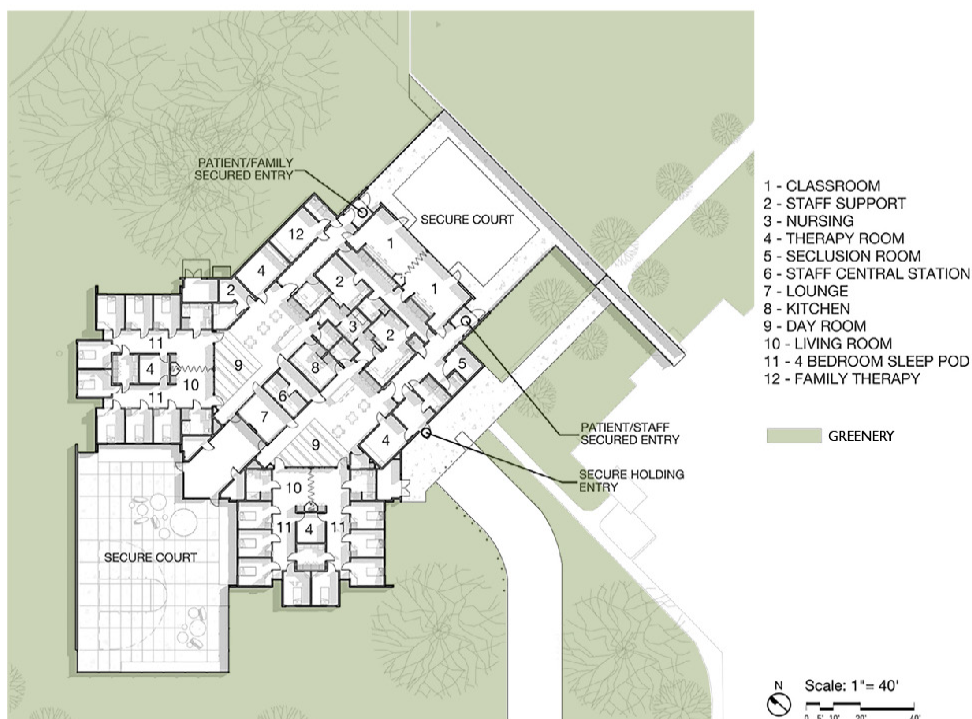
Plan View of Case Study Greenery (ArchDaily, n.d)
